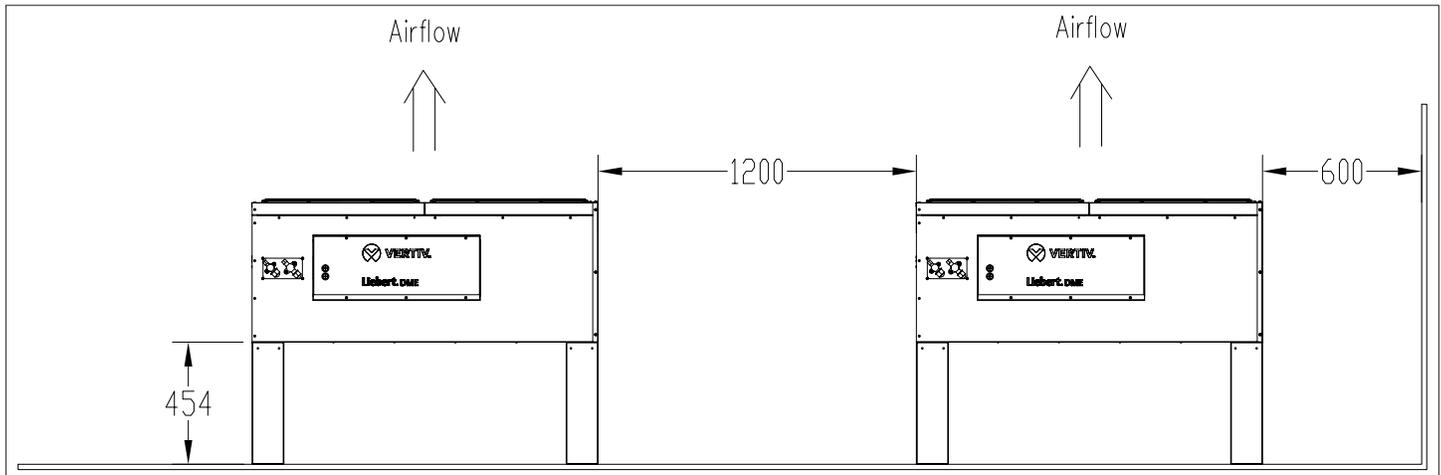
Horizontal Installation of Multiple Outdoor Units
